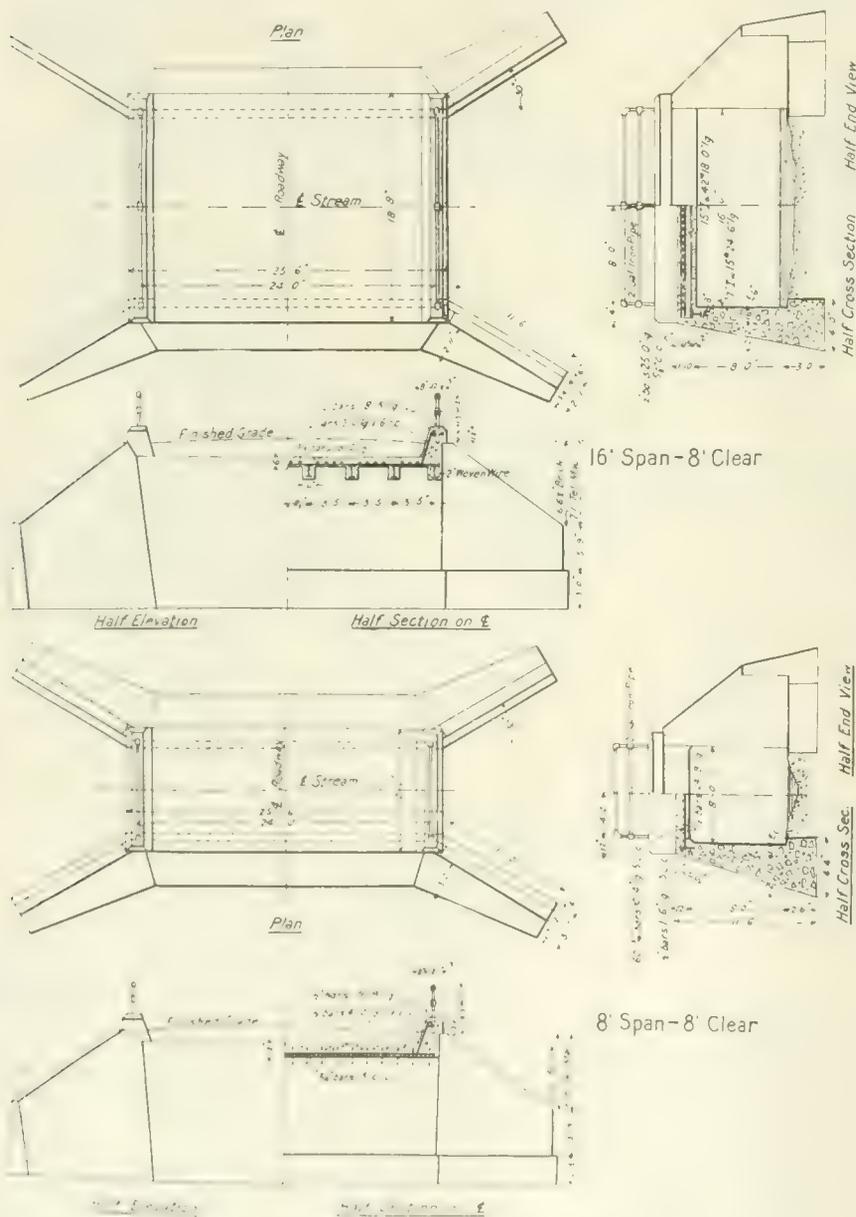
Reinforced Concrete Culverts of Slab, and Slab and Beam Types.
